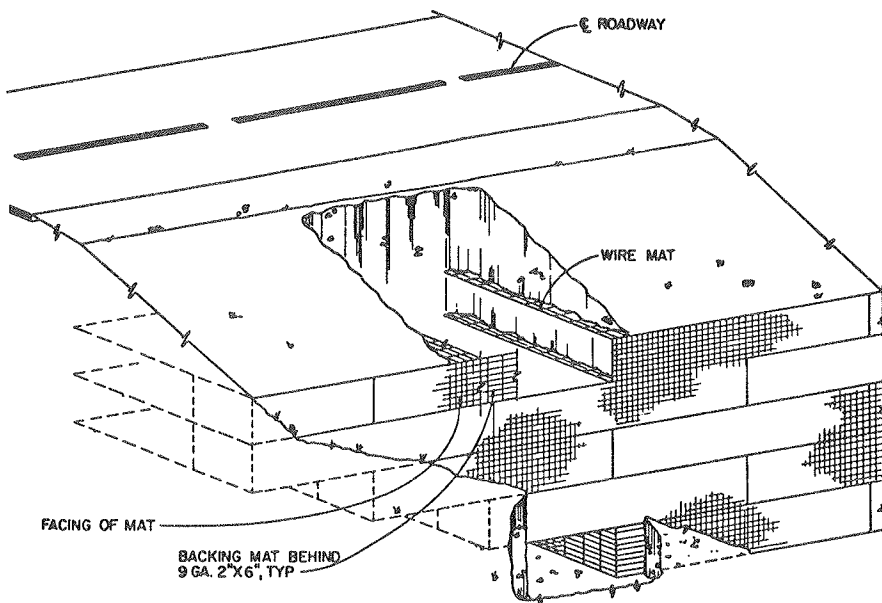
Schematic diagram of a Welded Wire Wall.
